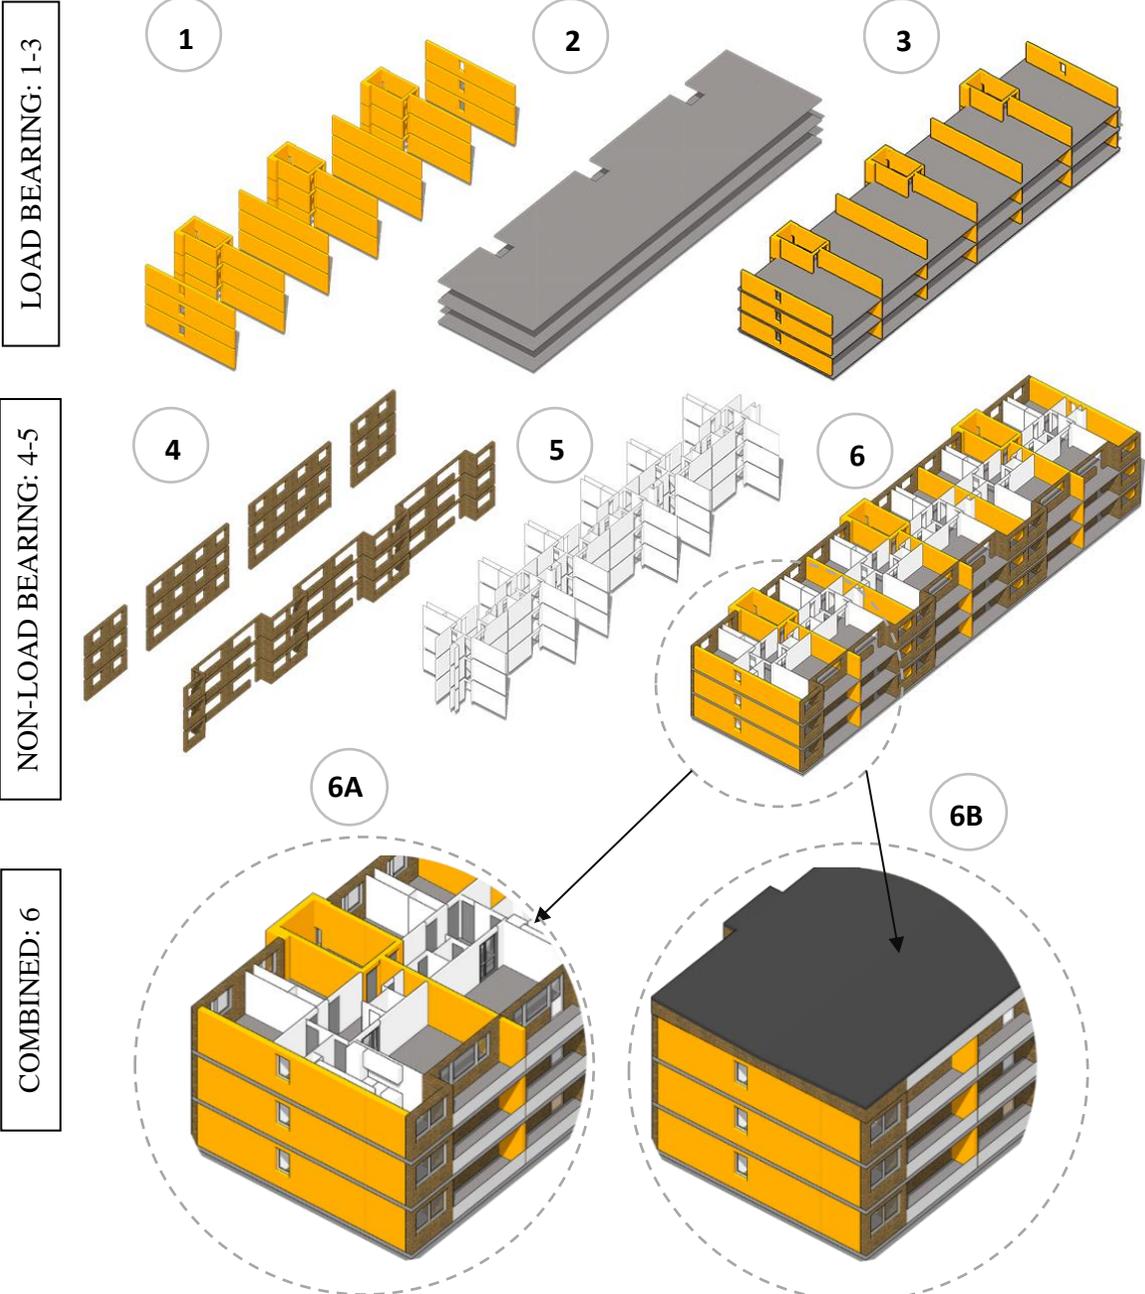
Structural analysis of the building: 1-3: Load-bearing building components; 3-5: Non load-bearing building components; 6 - Combined
